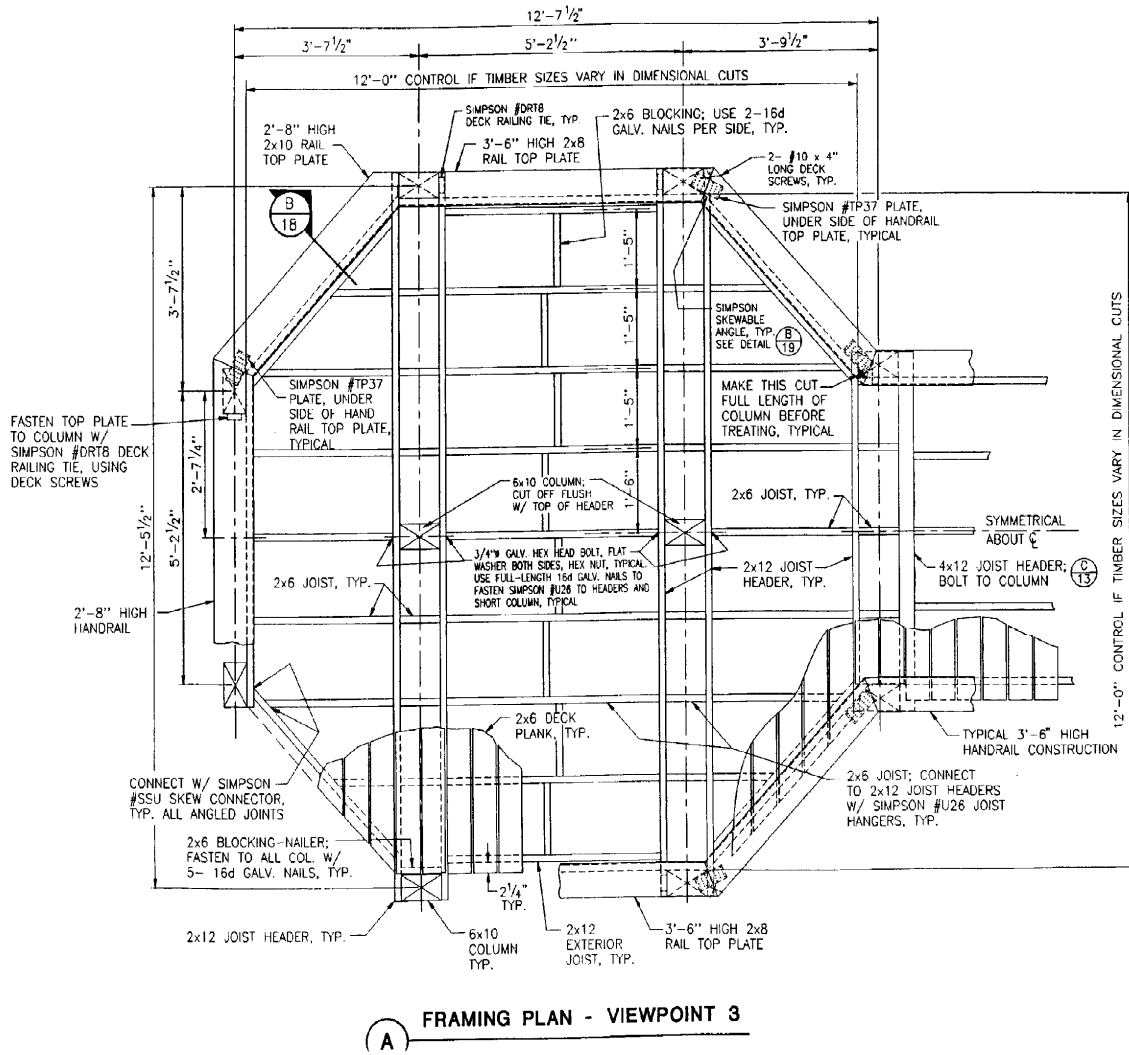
Framing details for construction of ACZA viewing platform, top view.
